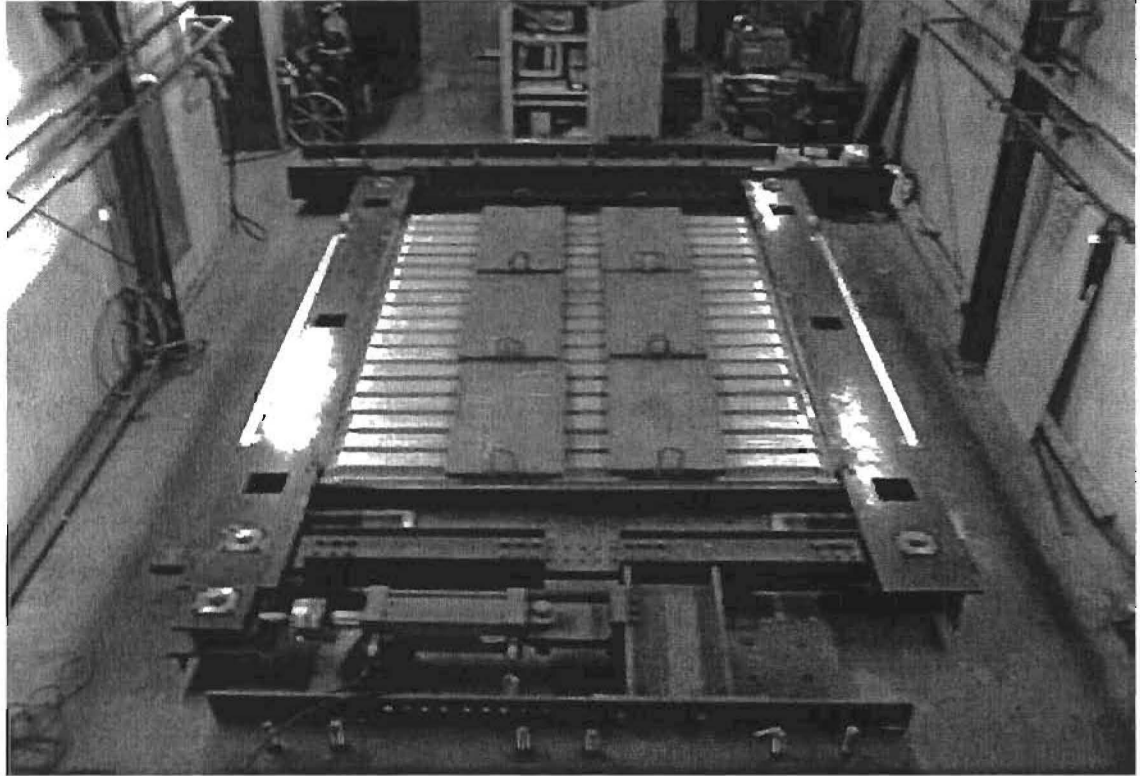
Shear Test Frame and Specimen with Simulated Concrete Load
